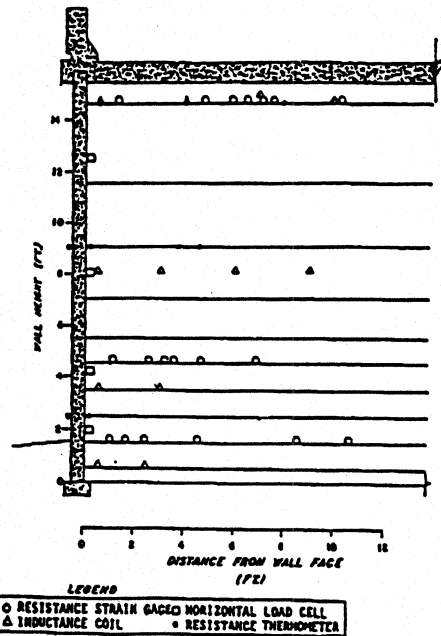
SCHEMATIC OF INSTRUMENTED EARTH REINFORCED RETAINING WALL (WALL 26-30)
